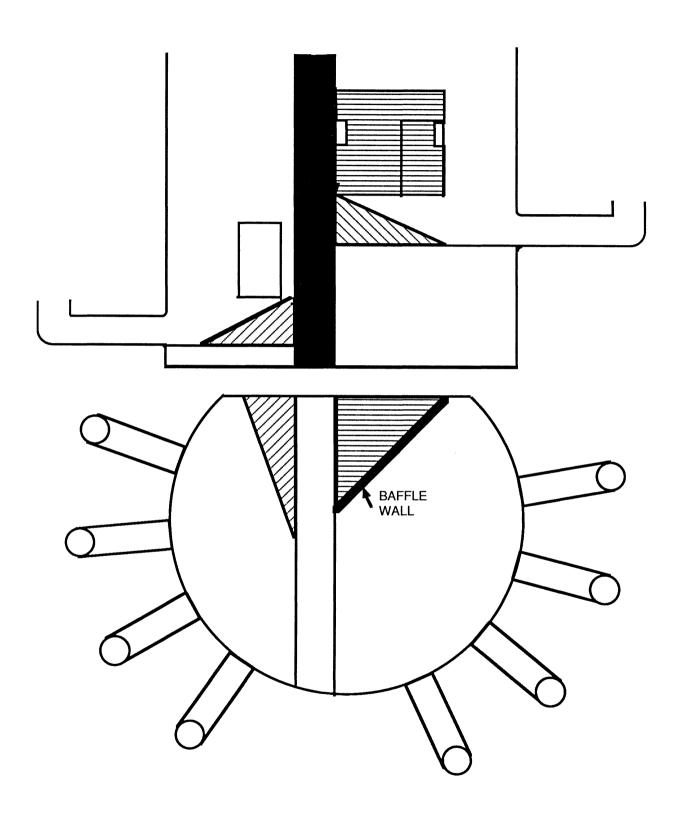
Modification of 20 Foot High Baffle Wall by Addition of Small End Notches.
